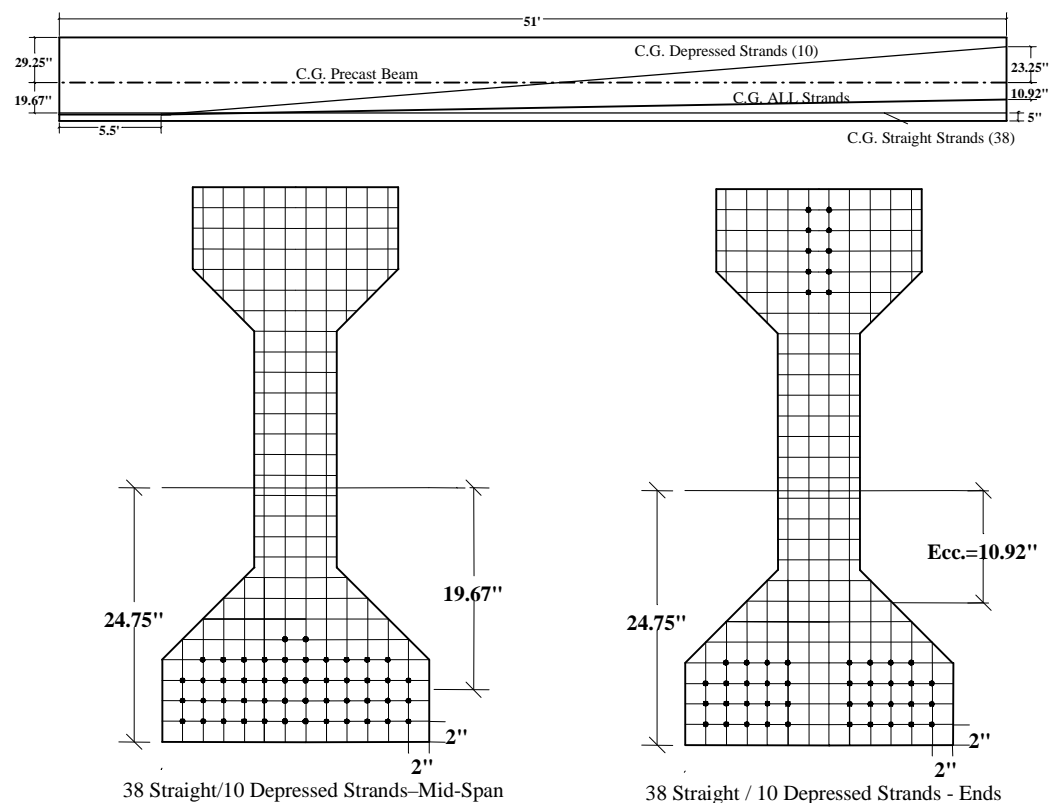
Elevation and Cross Section Views of the Girders, Mid-Span and End Sections, Nolanville Bridge
